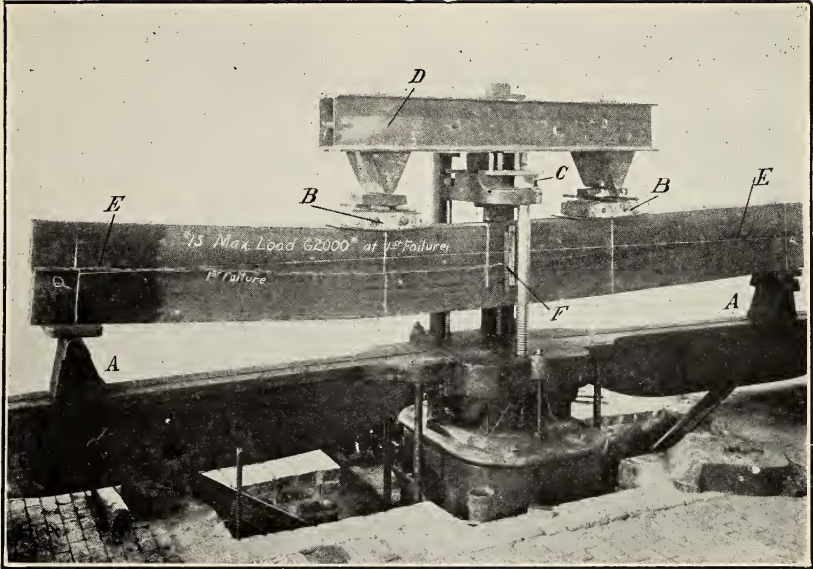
METHOD OF MAKING BENDING TESTS ON LARGE BEAMS.
